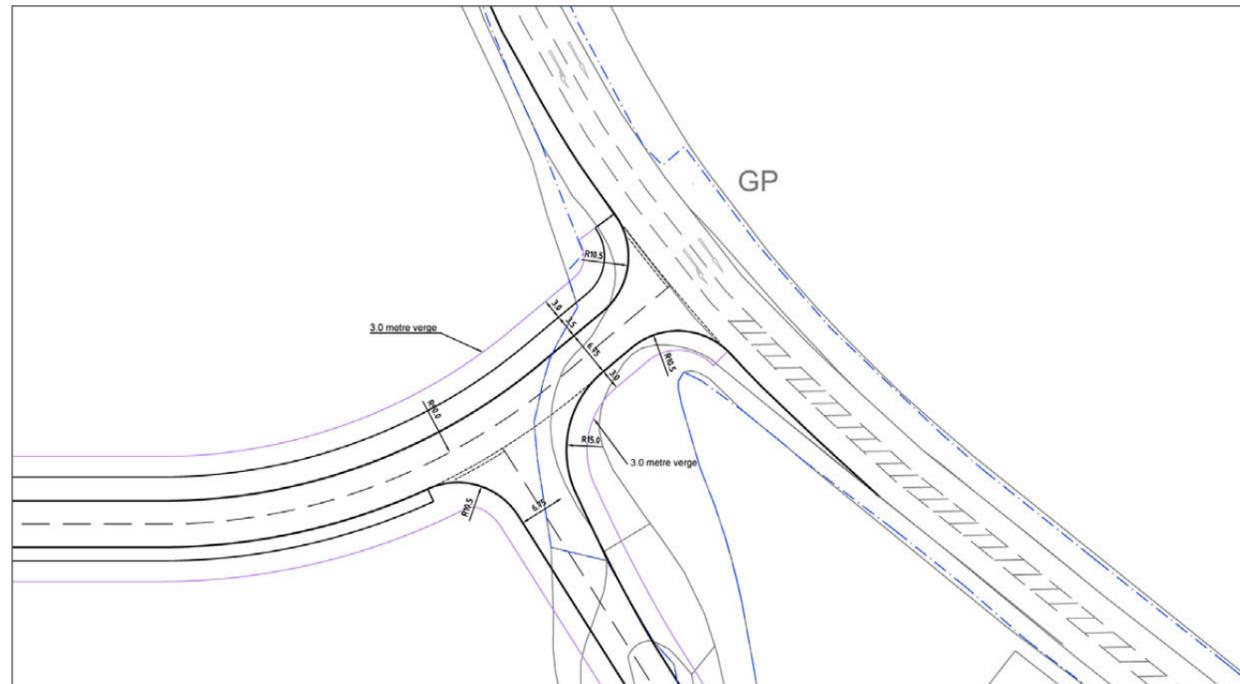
Mode Transport Planning - Proposed Northern Access Improvements
